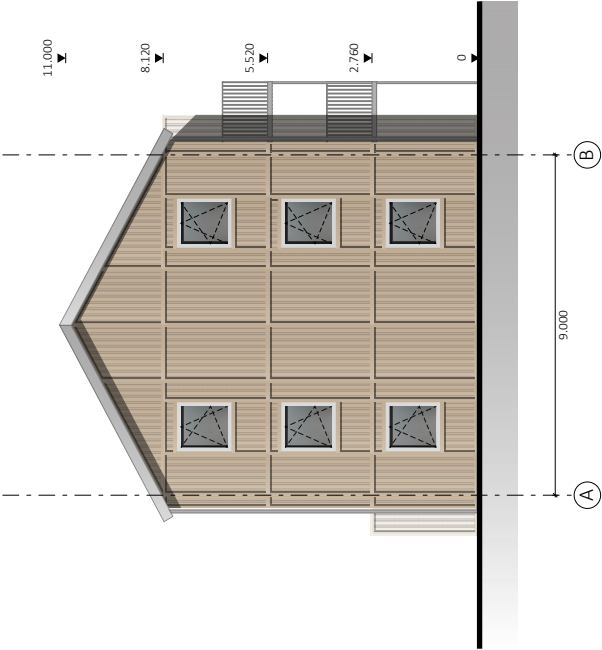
Elevation / 1:200 / East (own illustration)
